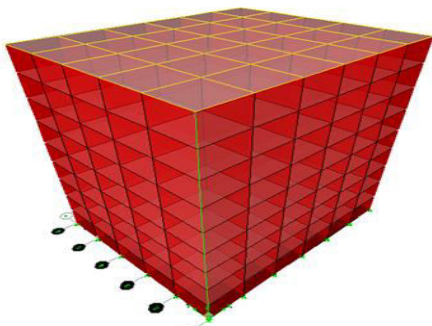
Elevation of nine storeyed Building Model 3 (full infill)
